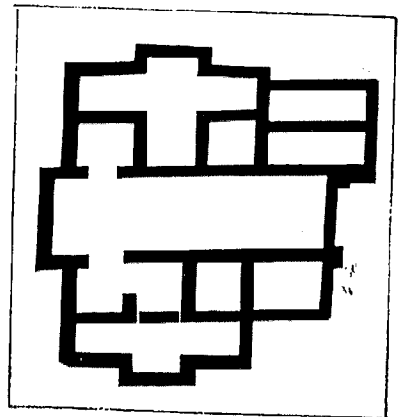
Plan of House in level II at Tell Abadeh (after Jasim 1979, Fig. 2).
